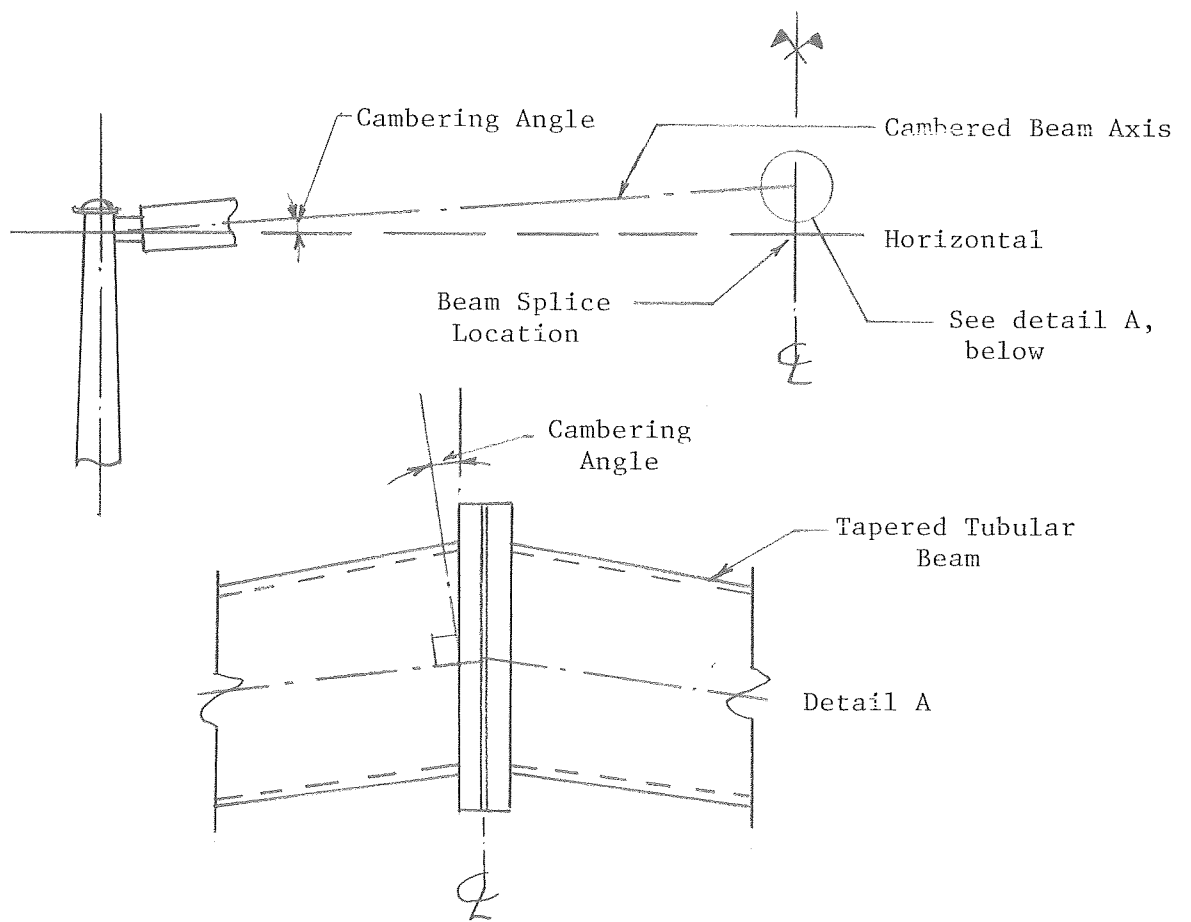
Beam Splice Detail to Achieve Suitable Camber
